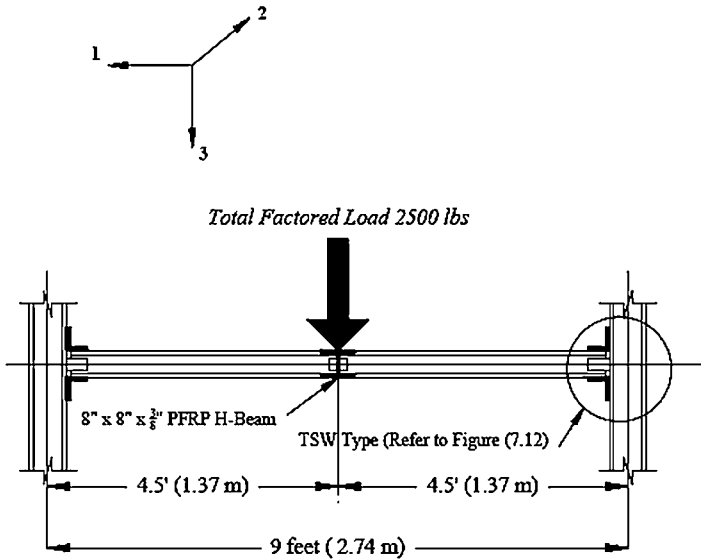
Details of the semi-rigid connected PFRP beam of Example 8-1.
